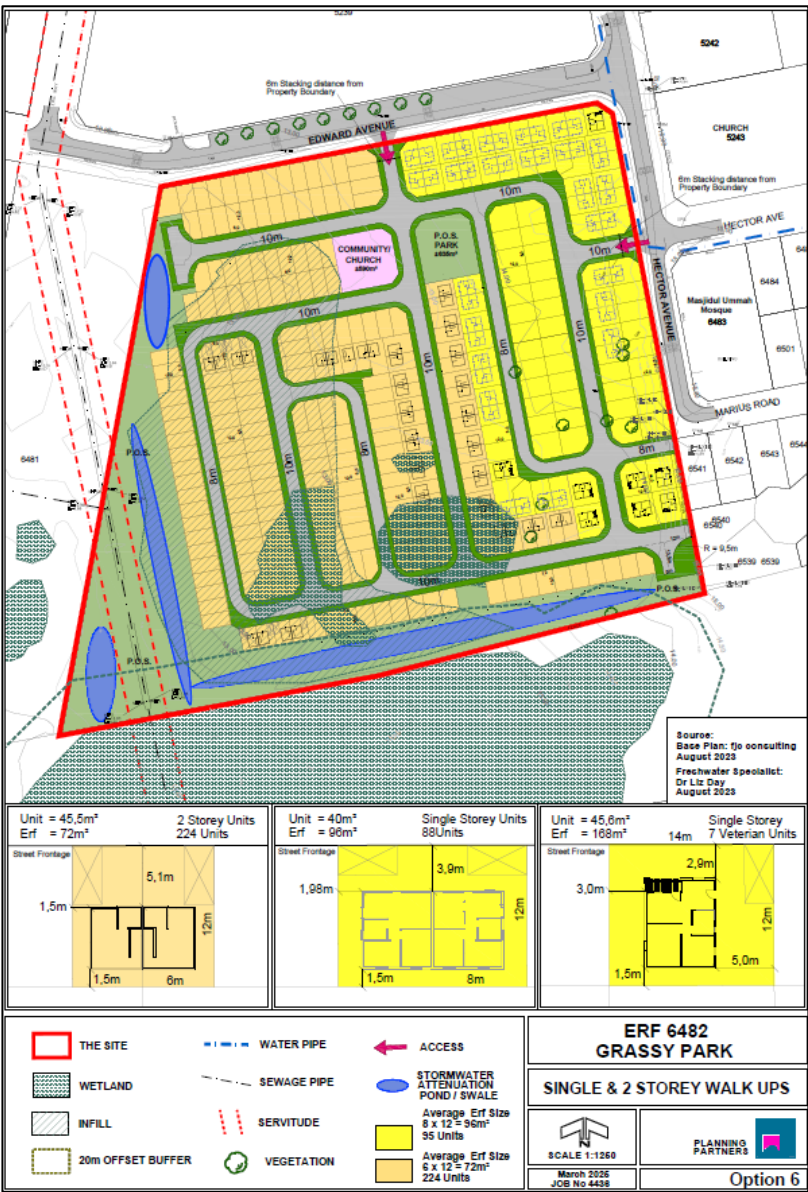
Alternative 1 Concept Development Plan (source: Planning Partners, 2025)
